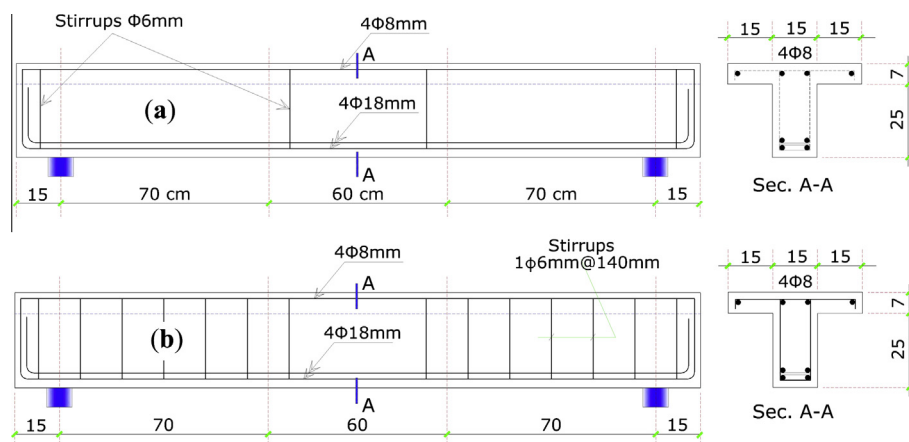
Details of internal reinforcement of tested beams: (a) group C and (b) group D.
